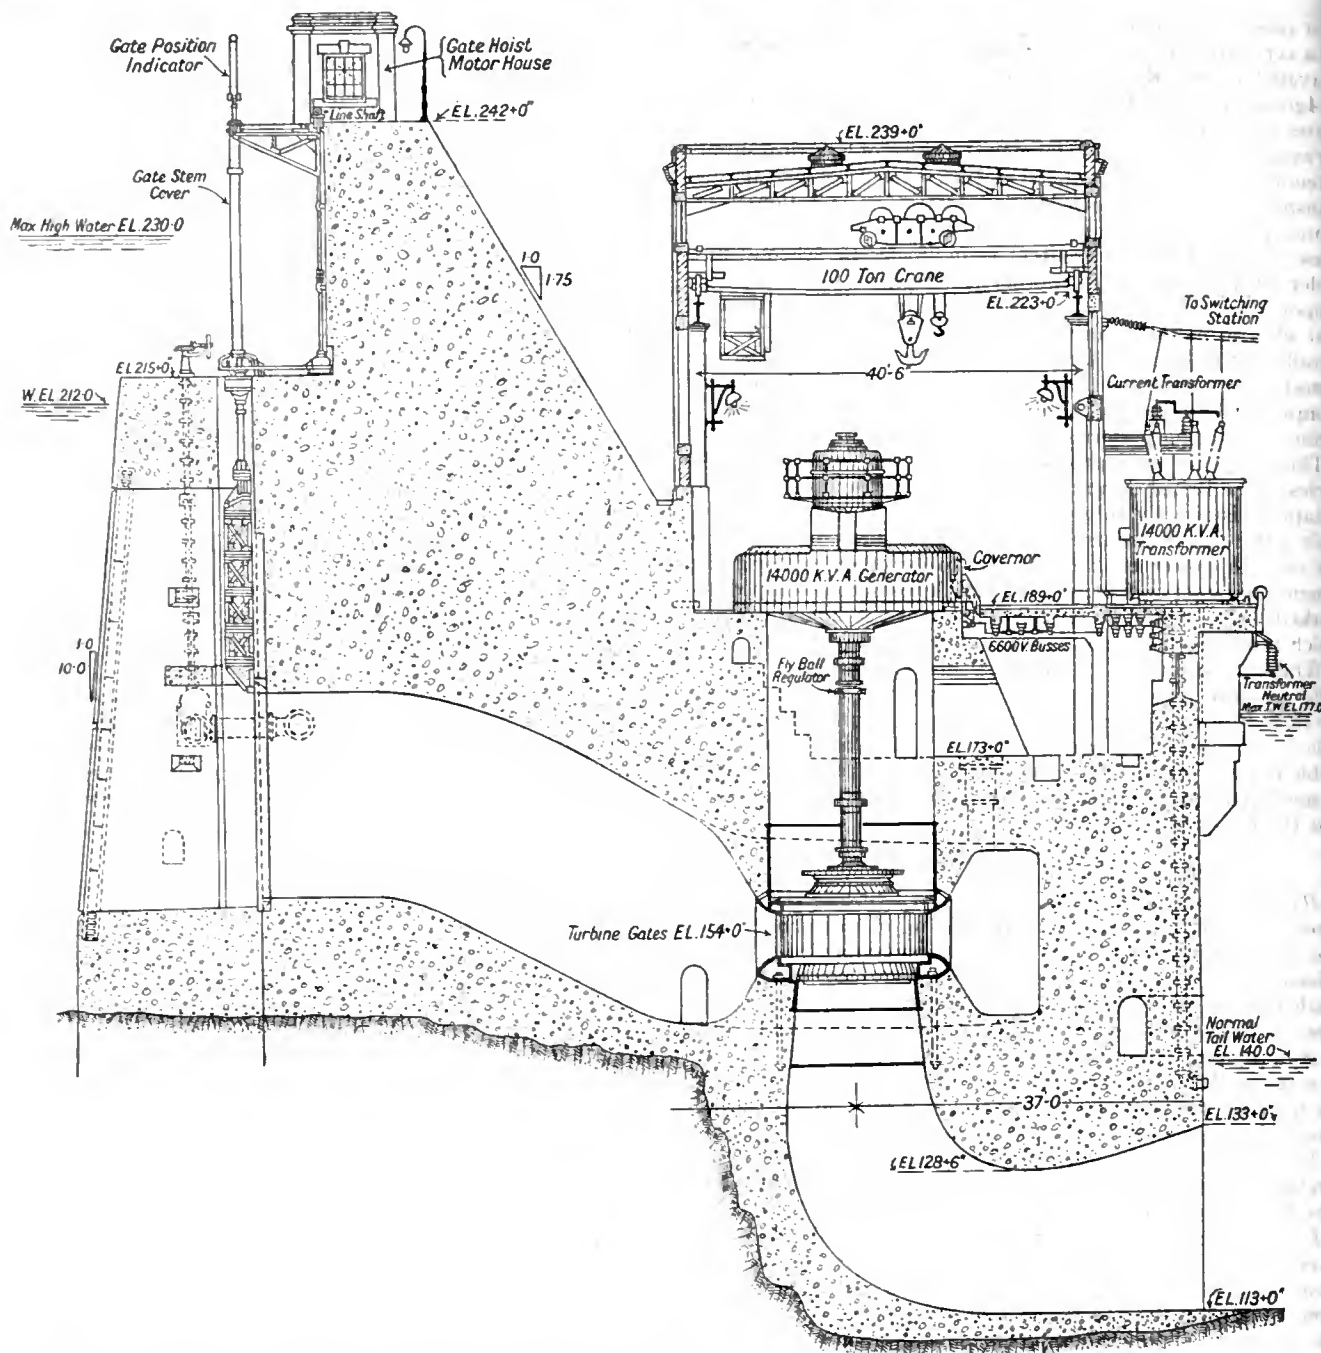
Hydroelectric station with outdoor transformers and high-tension switch gear. 14,000 K. V. A. under 80 ft. head.
